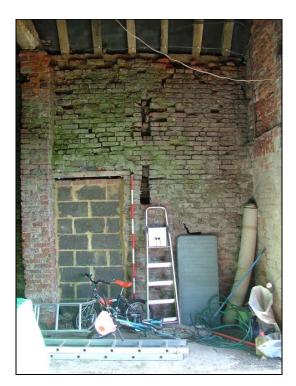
Blocked doorway and ventilation slits, south end of east internal elevation (Scale = 2m)
